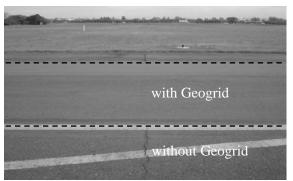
Joints of the concrete slabs reflect in the area where no reinforcement was used
